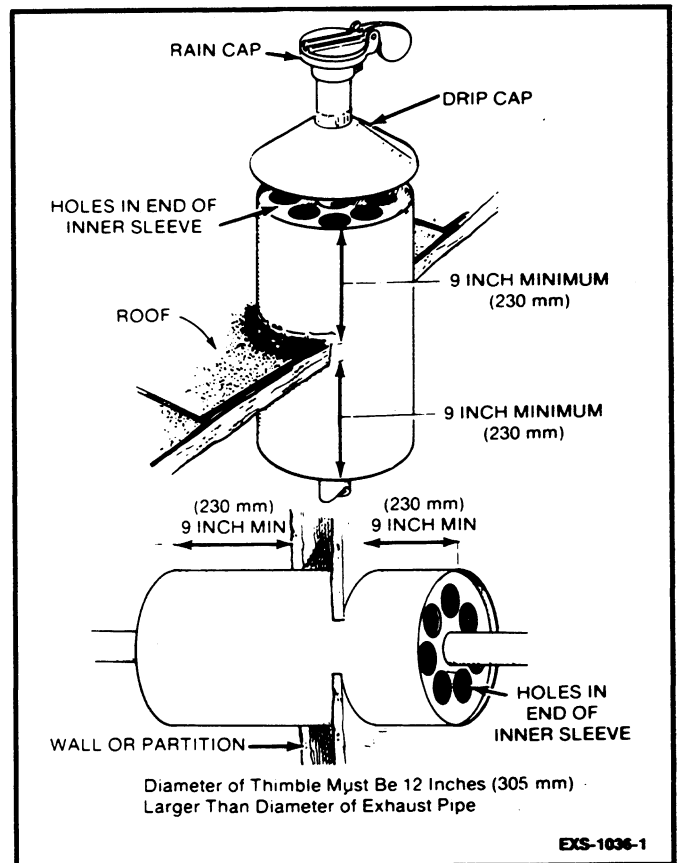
MOUNTING EXHAUST THIMBLE THROUGH ROOF OR WALL
